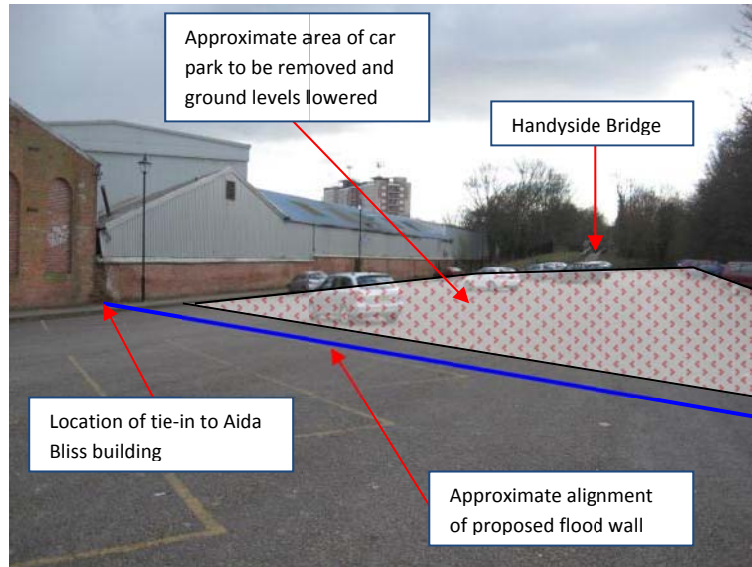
Proposed layout of flood wall and ground lowering at City Road car park
